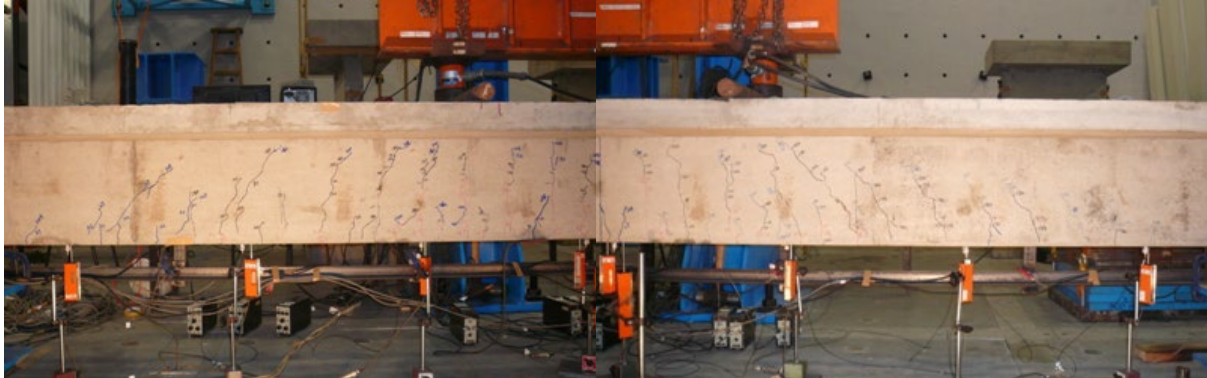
observed cracks in the web elements of the concrete bridge model
